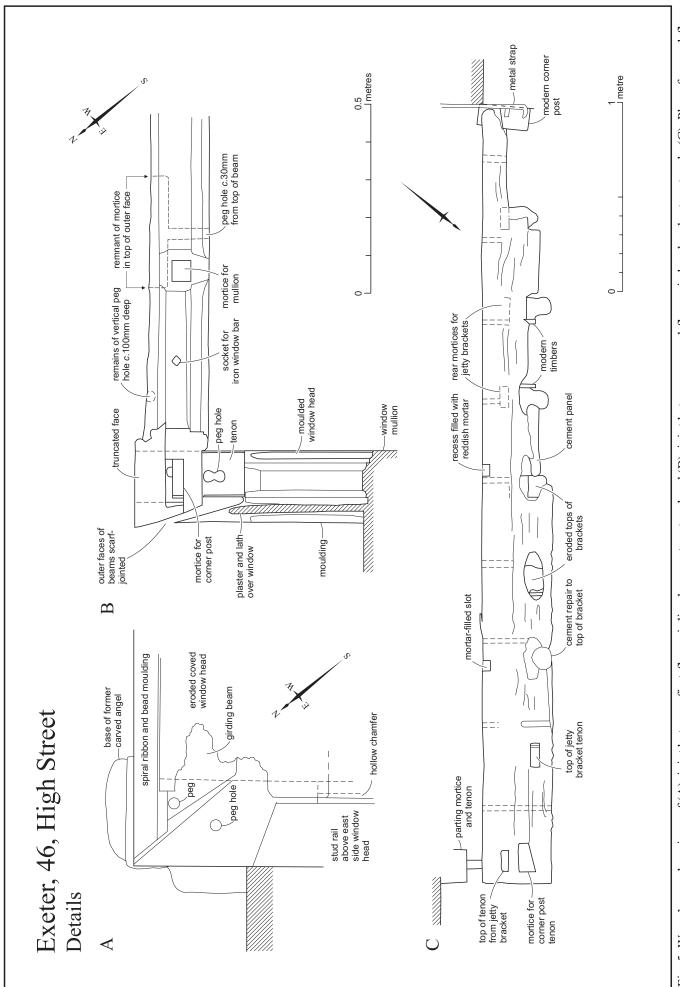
Worm's eye plan views of (A), joint between first-floor girding beams at east end and (B), joint between second-floor window heads at east end. (C), Plan of second-floor window sill beam in situ. Scales 1:10 and 1:20.
